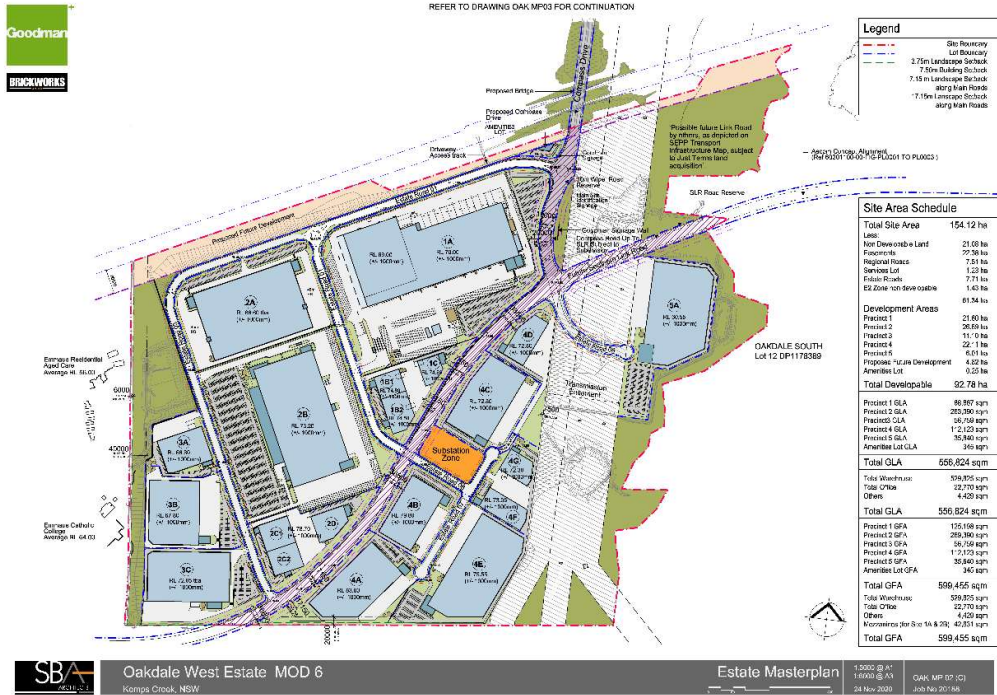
Proposed Masterplan Layout (Source: SBA Architects)
